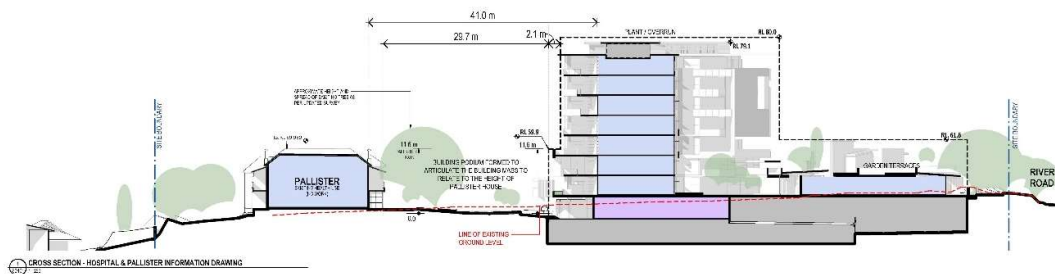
Section showing the relationship between Pallister and the main building. (Source: Bickerton Masters Dwg 1213 IN.32 P5)
